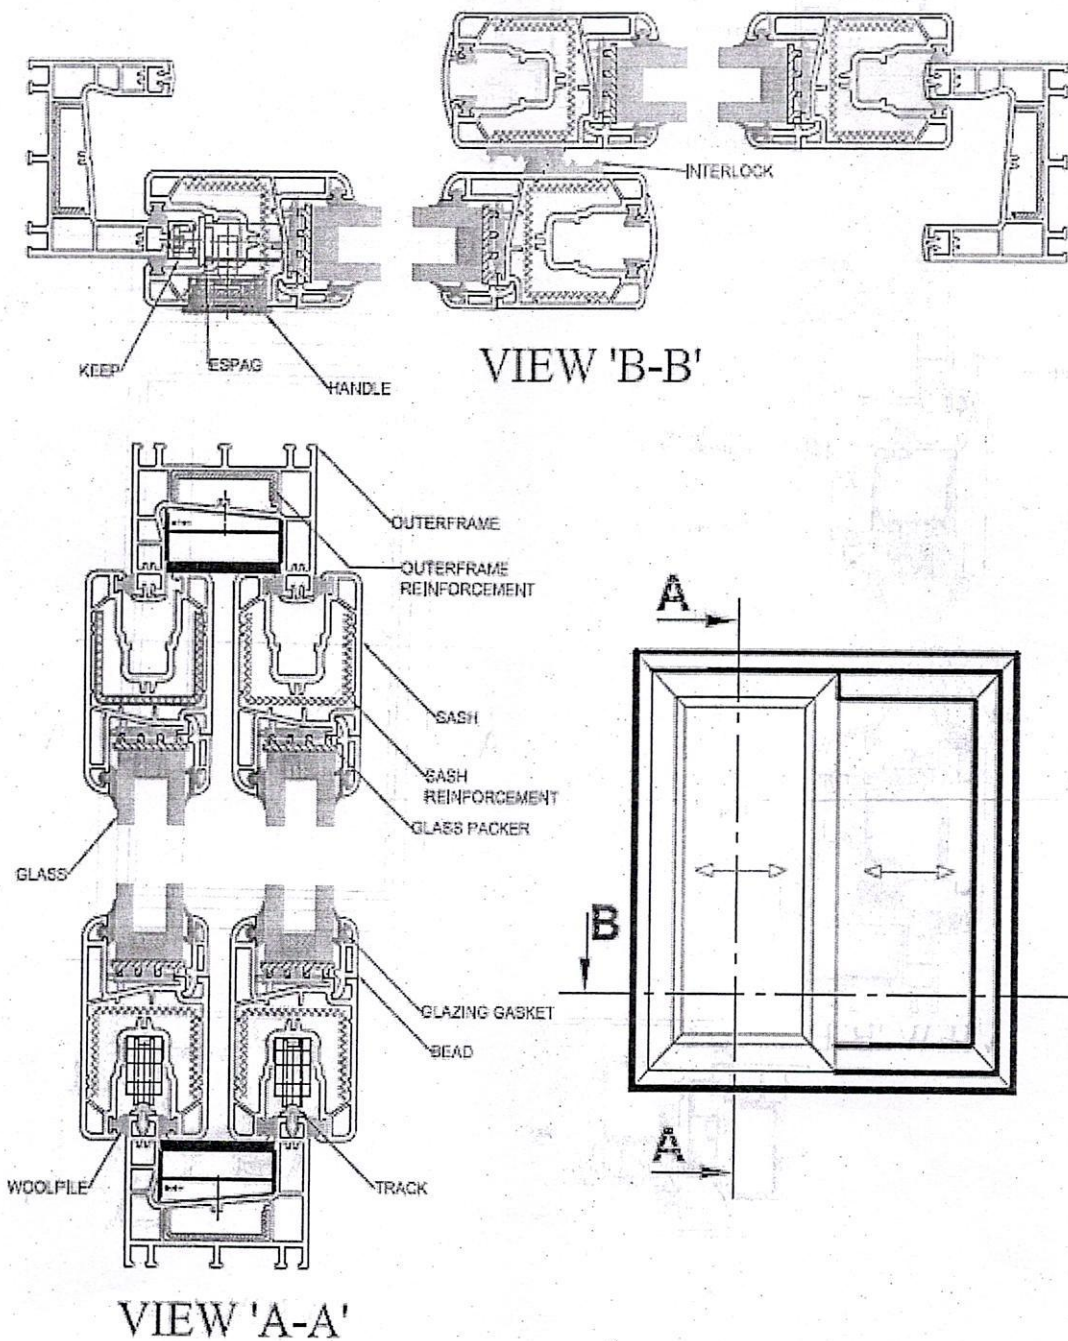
uPVC Doors and Windows (Typical slider system)
